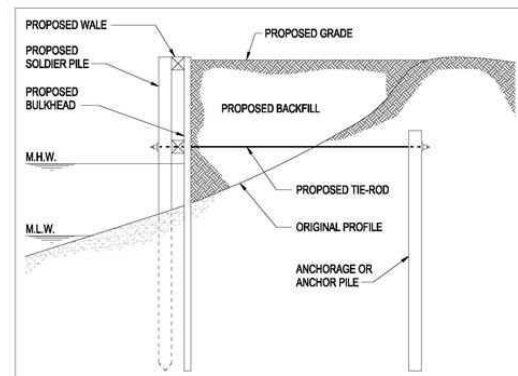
Typical bulkhead cross-section (NC DCM, 2008).
